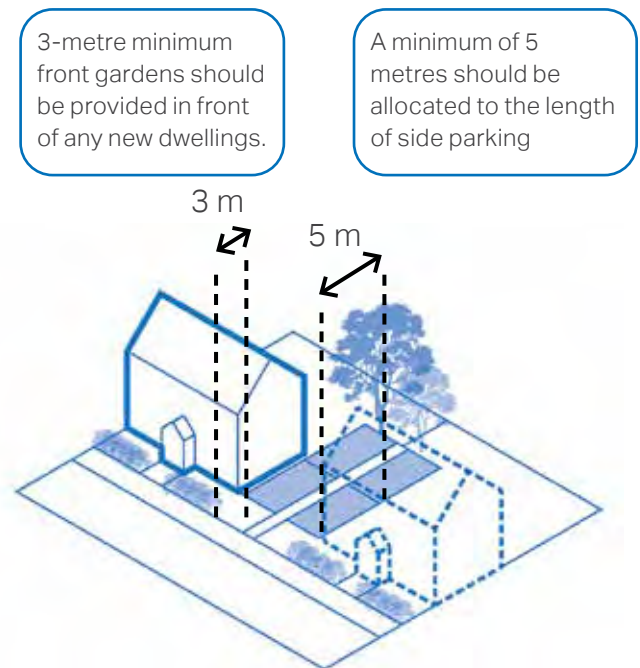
Illustrative diagram showing an indicative layout of on-plot side parking.
